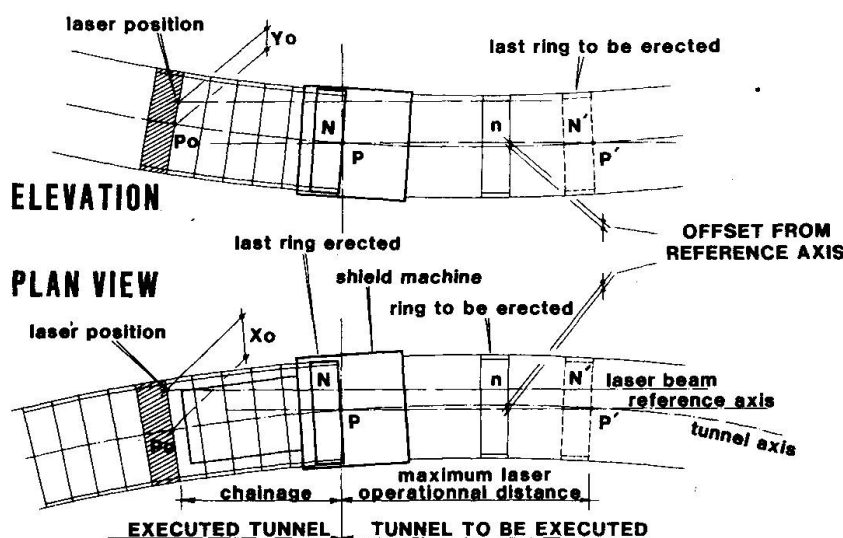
Section and plan views of the alignment geometry during tunnelling
